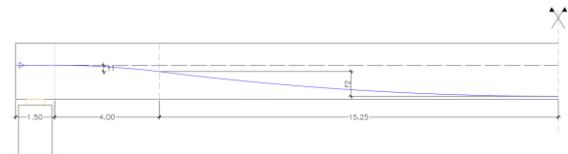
Pre-stress layouts for the upper level of anchorage in beams 1 and 2
